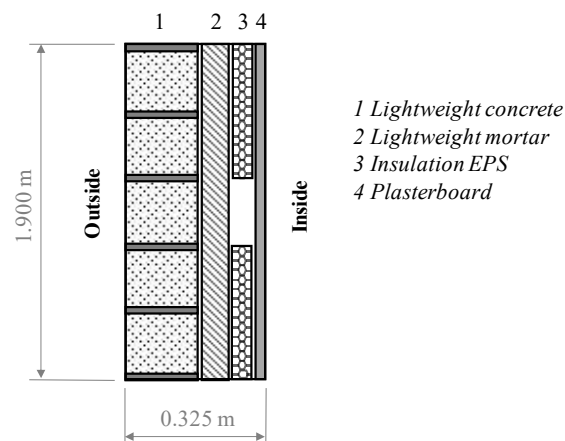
(c). Multi-leaf wall with internal horizontal thermal bridge (W3)
